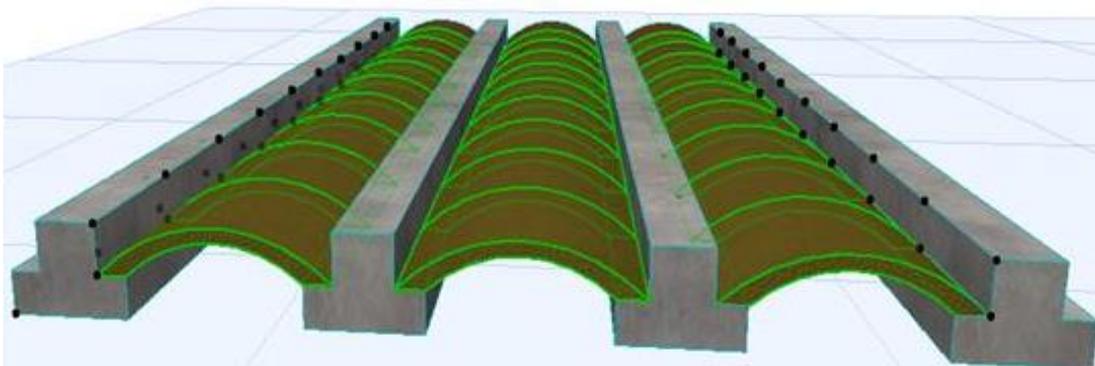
Slab element arches built on and supported by Inverted T- beams.
